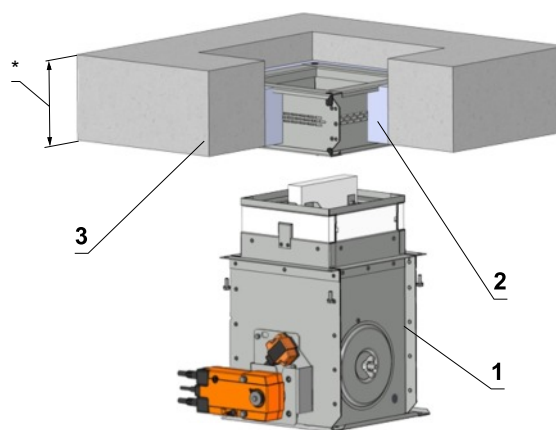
Solid ceiling construction - installation frame E1, E2, E4
